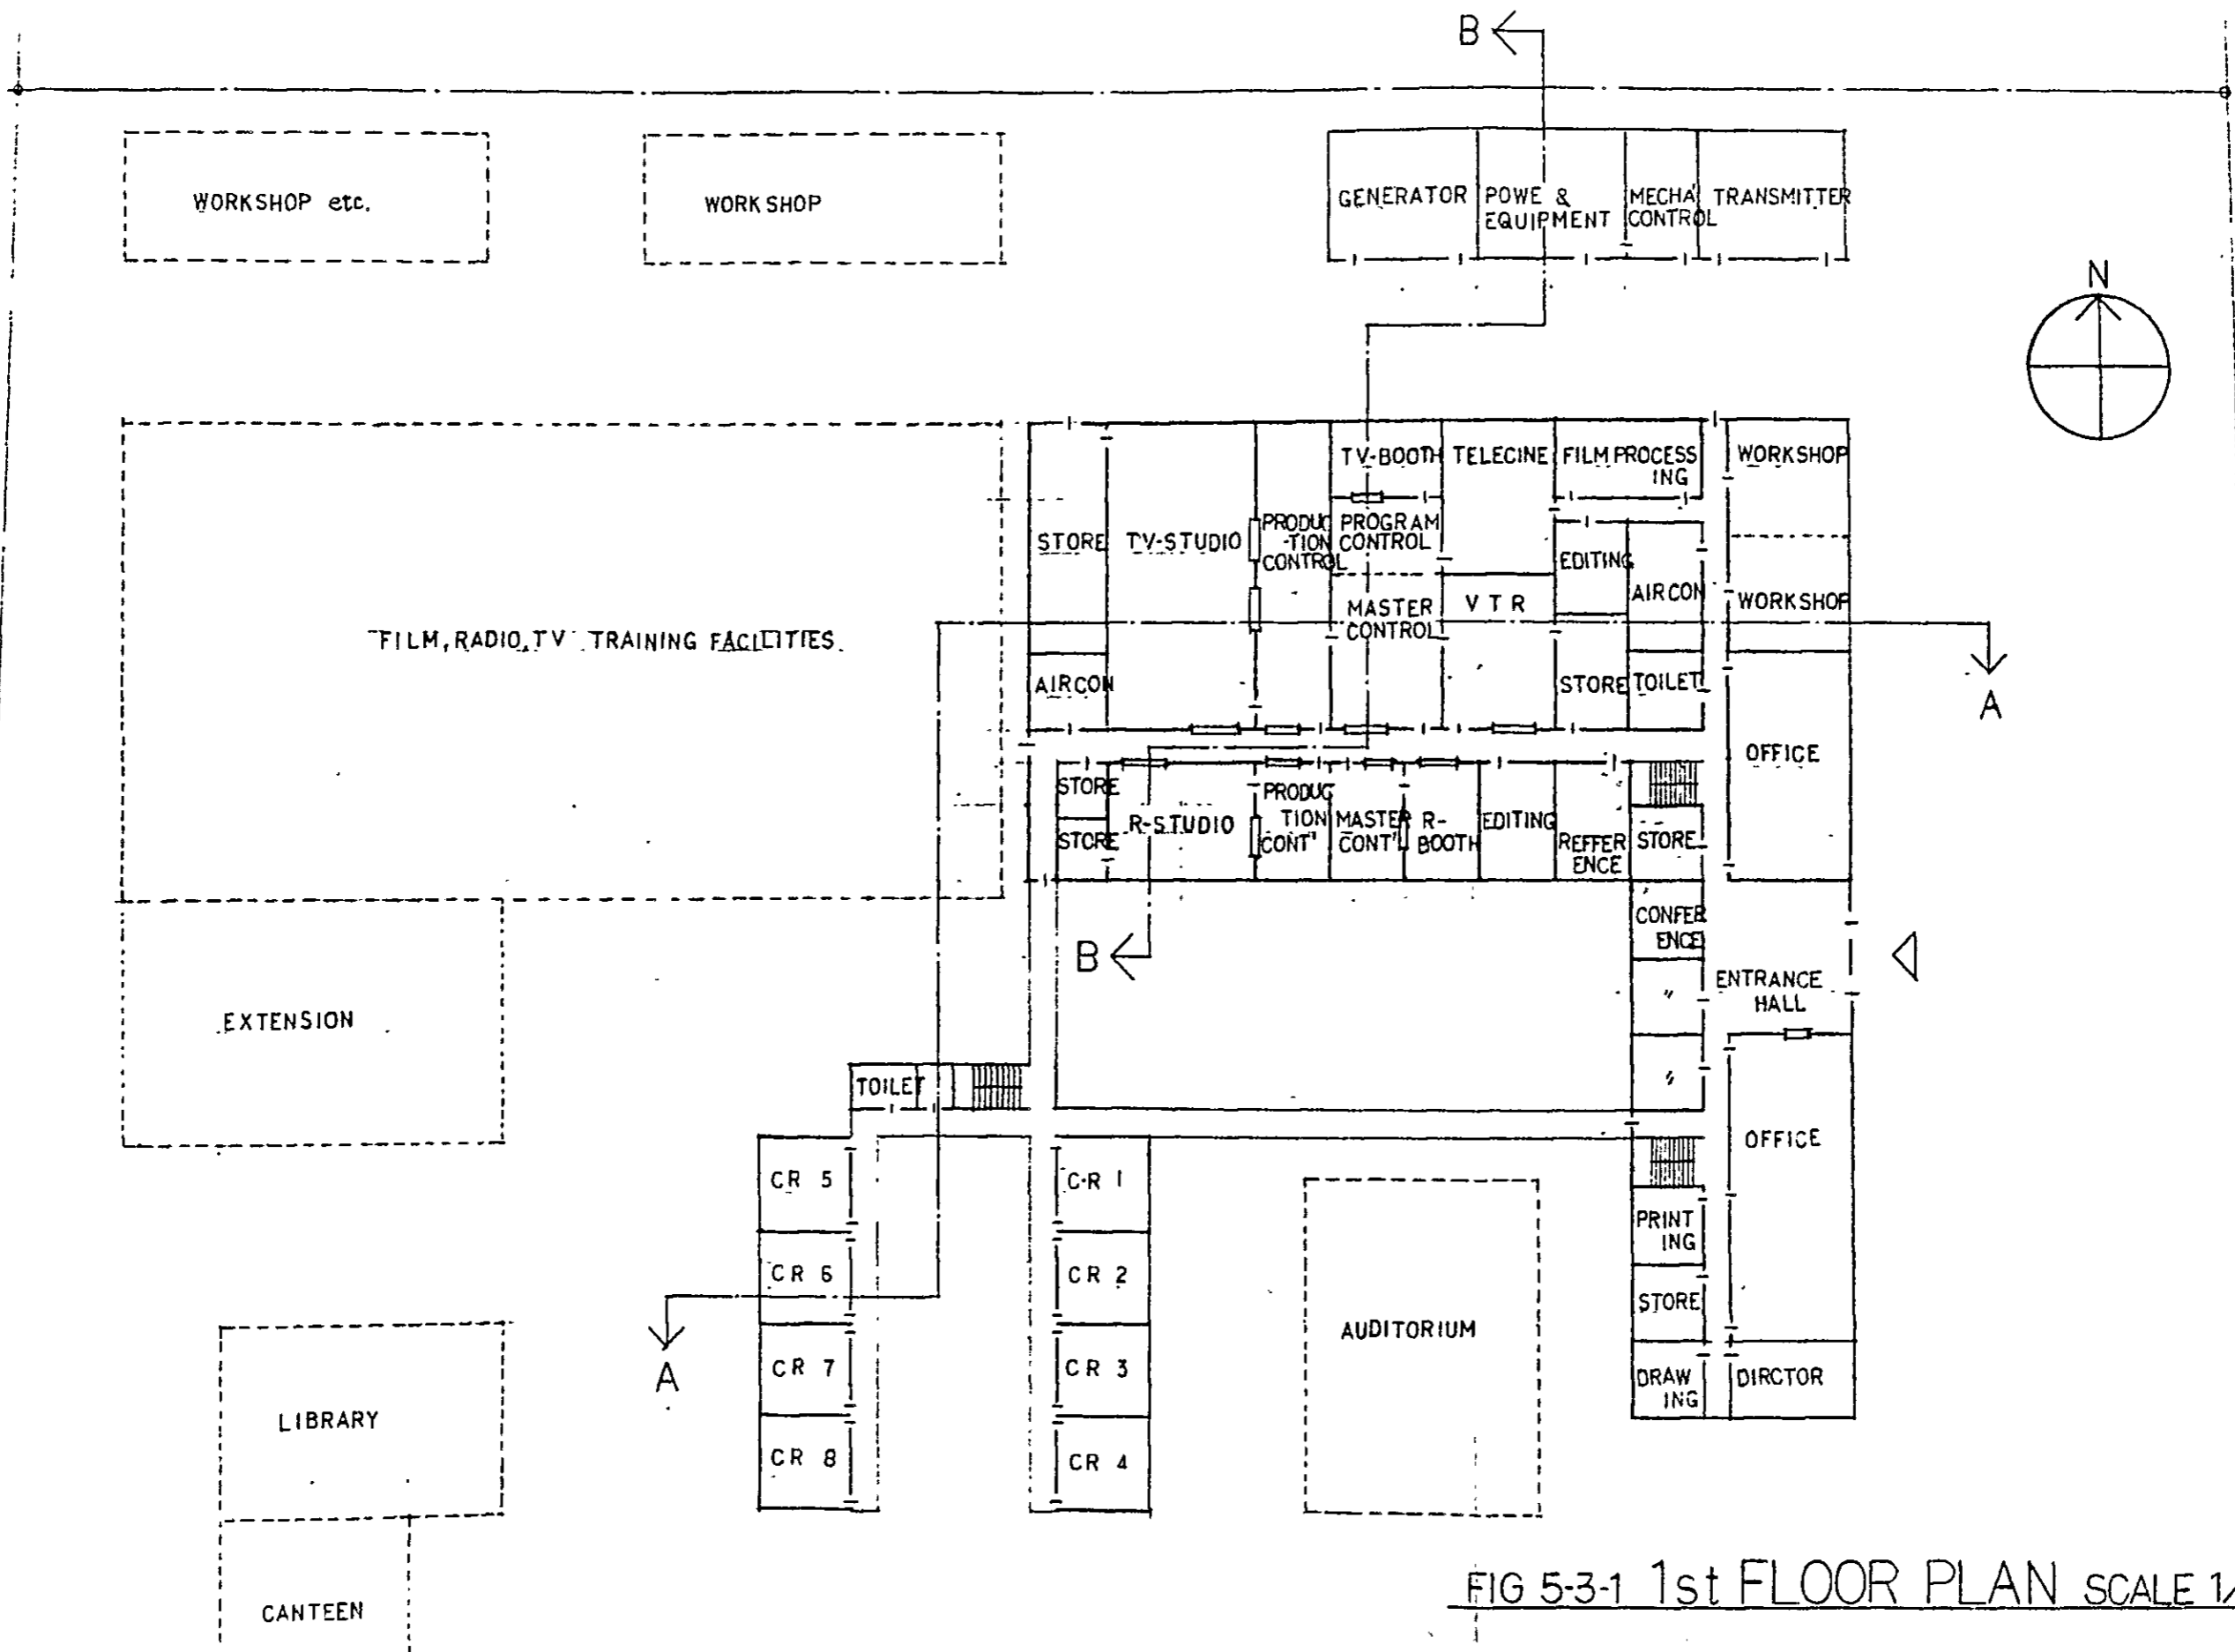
1st FLOOR PLAN SCALE 1/500
